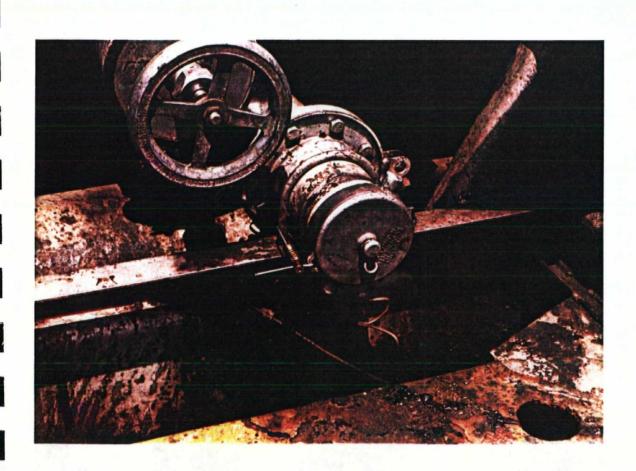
Renovating On Site Rail Spur. 6/10/85
